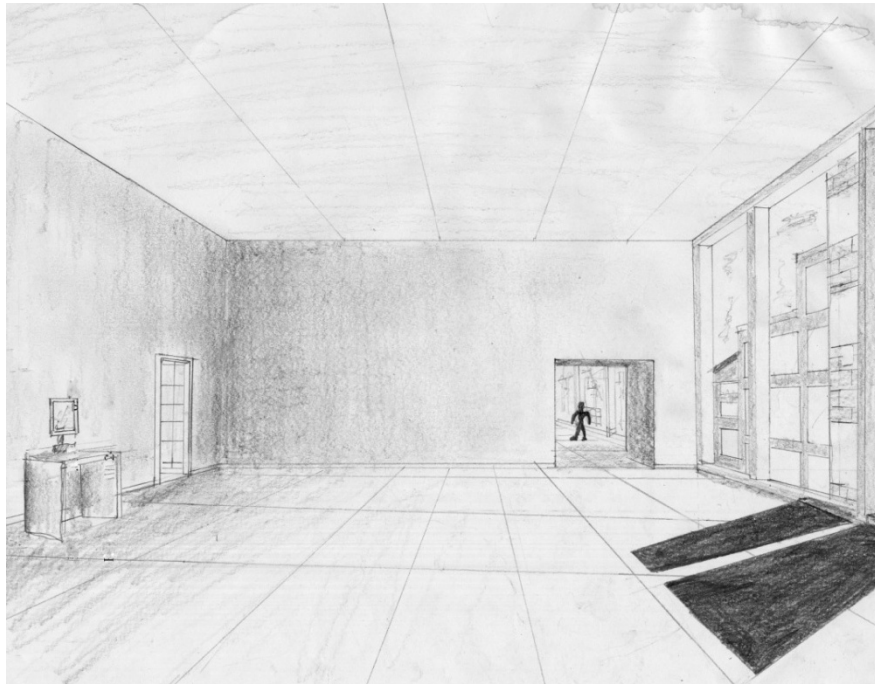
Deep beam with opening for circulation used in a high rise building
